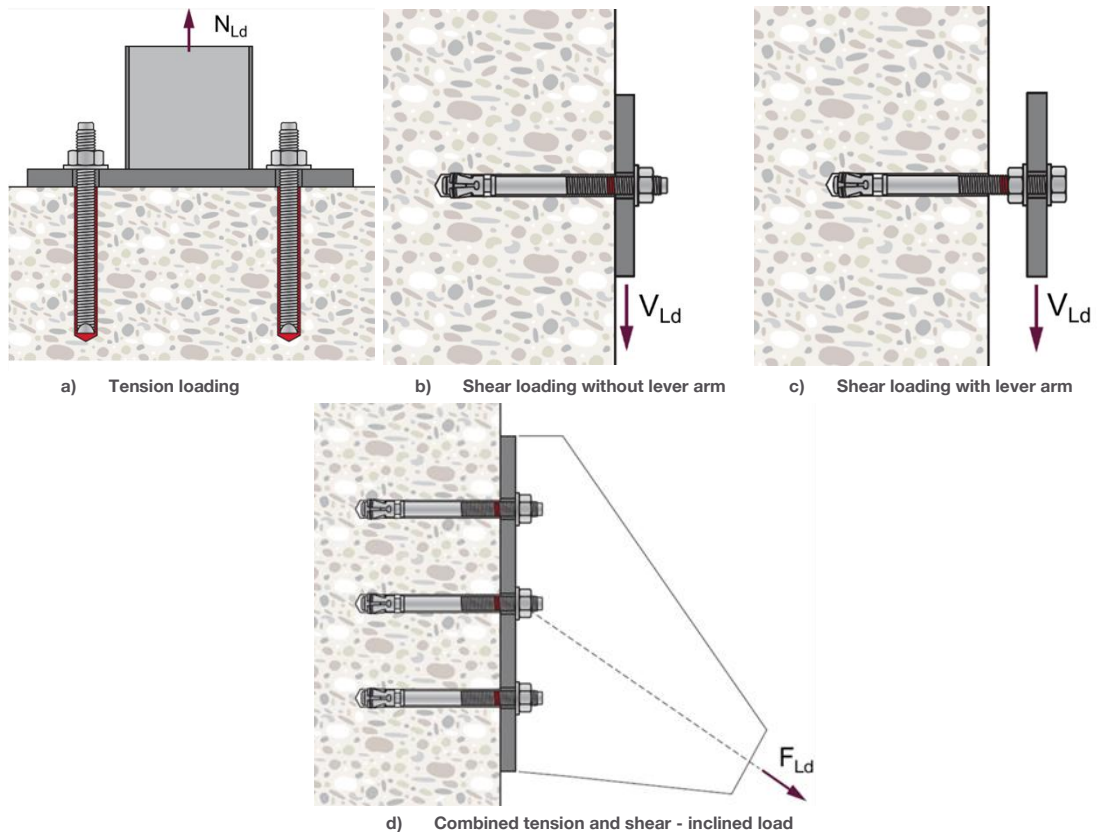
Tension and shear load acting on anchors anchored with attachments to concrete
